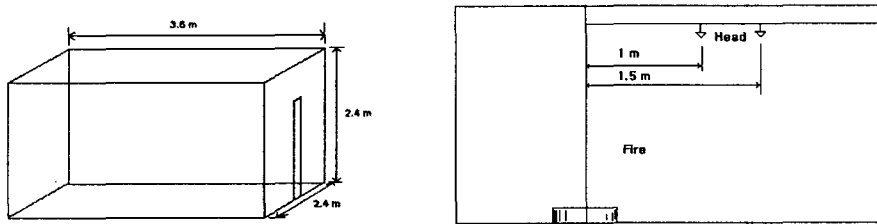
A drawing of Test Room and Installation Point of Sprinkler Head
